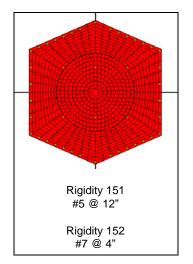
LM Pier 6 – SPEMC Model (identical to Pier 5 LM)
